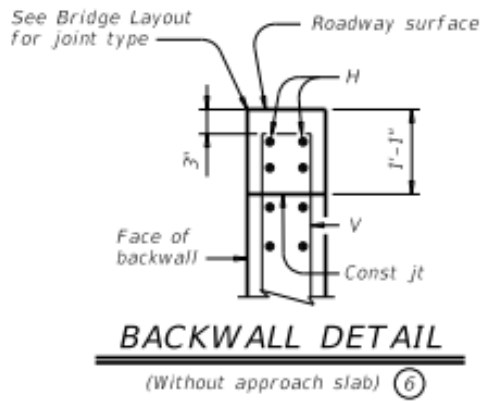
Abutment Back-Wall and Wing-Wall Details
